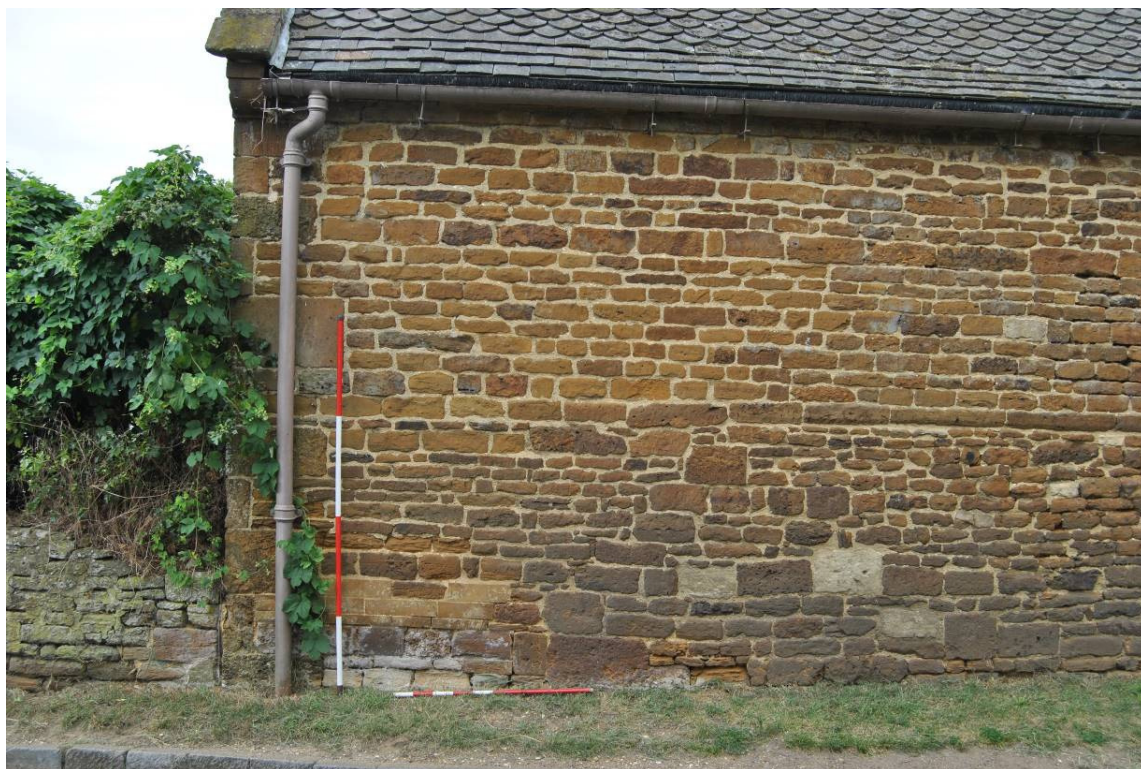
Irregular stonework at south end of east elevation corresponds approximately to Dryden's extension of 1858.
